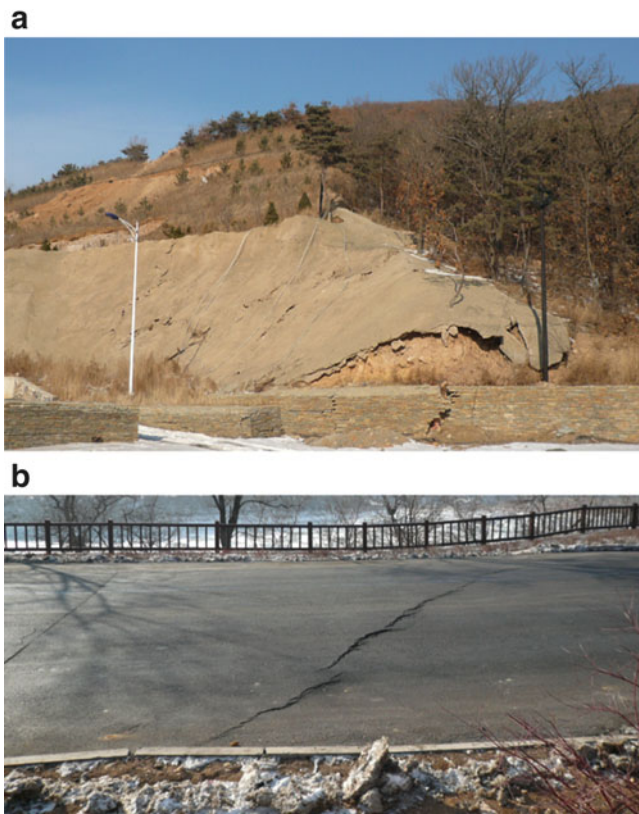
Damage caused by the landslide. (a) Failure at the slope toe and (b) Crack on the surface of road
